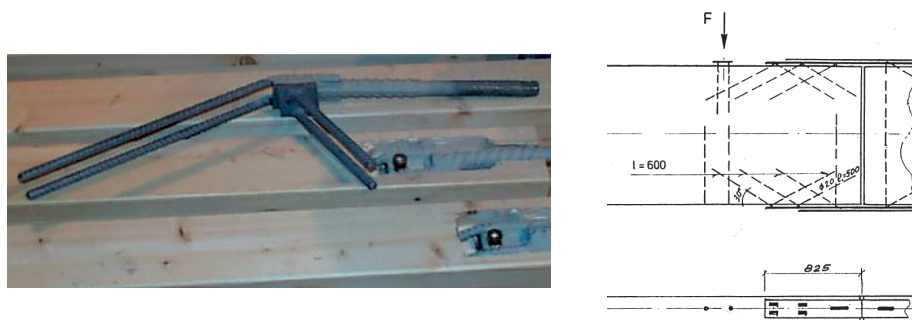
V-connection with glued-in rods: glued-in rod couples welded to a connecting steel rod (left), experimentally investigated beam splice (right), [33]
